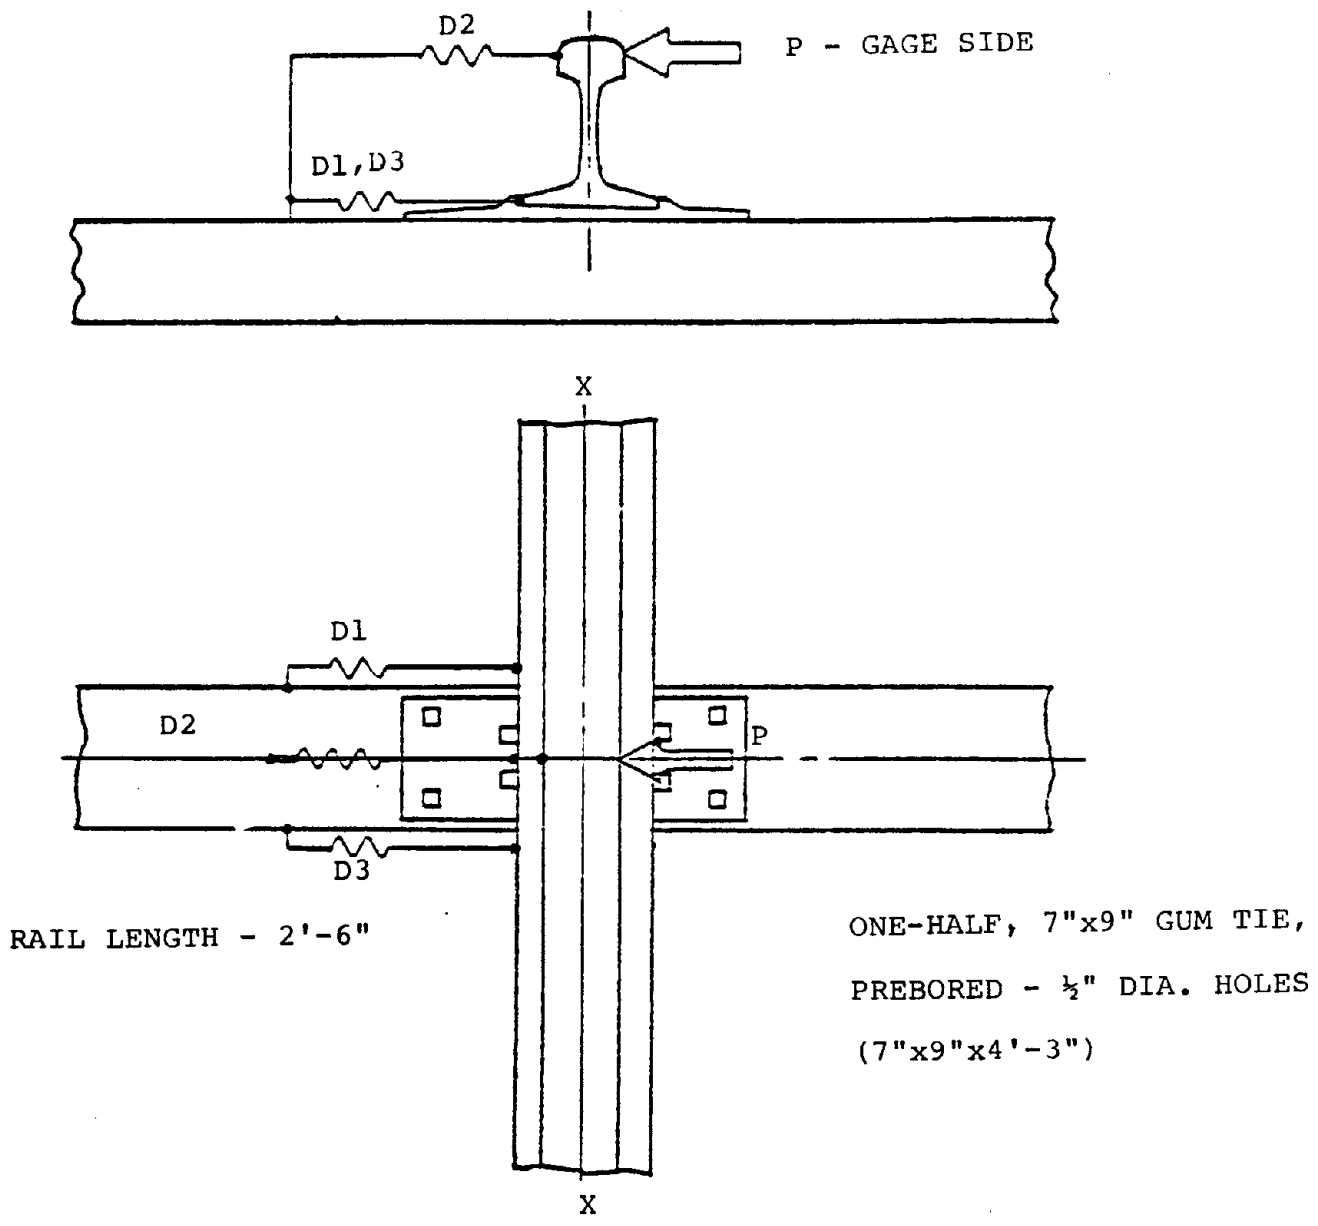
Fastener Stiffness Test About Longitudinal Axis
